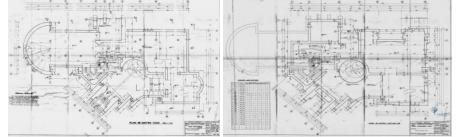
(Up: Ground floor plan), (Down: first floor plan) (Archive of the Construction Institute, Tirana,
